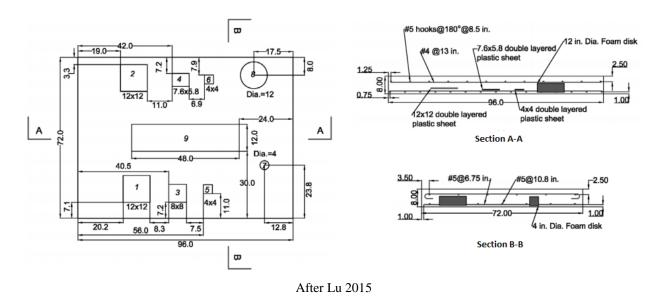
Plan and section views of the concrete slab with known defects
